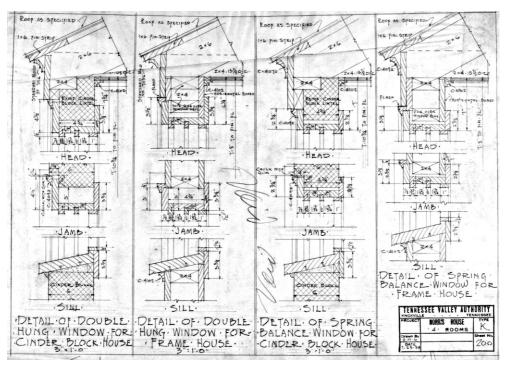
Details for Norris House Type K. Includes Details for Both Frame Construction and for Walls made of Cinder Blocks. (Source: TVA Archive, National Archives Building, Atlanta, GA, RPS 263)
